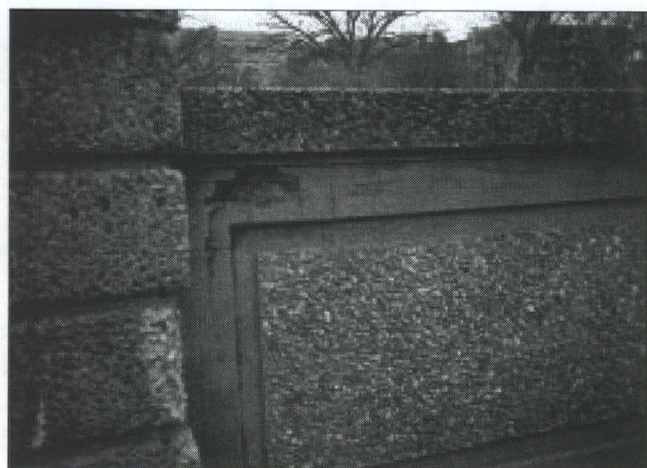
Exposed aggregate concrete detailing on the 16th Street boundary wall, 1997. Note the flat, trowelled borders to the exposed aggregate panels. See plan sheet 28 (Land Ethics, Inc.).
